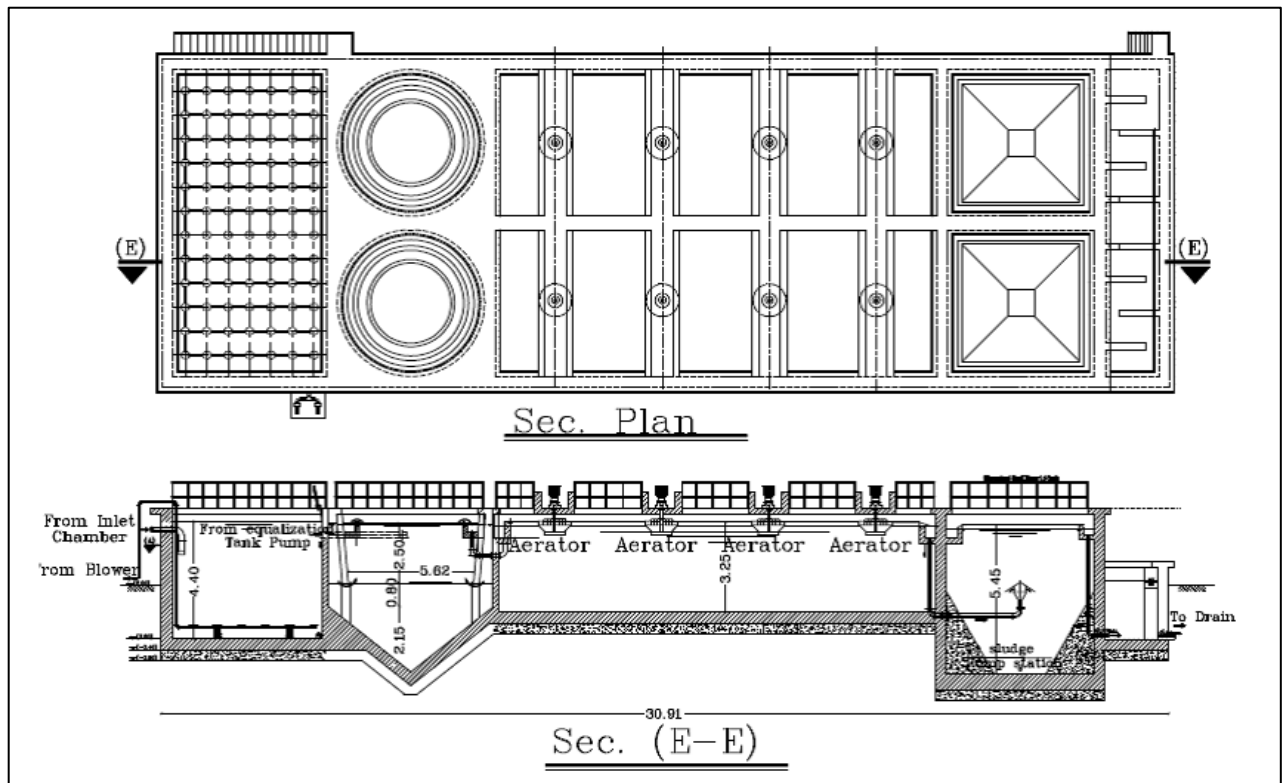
Section elevation in the compact unit in the proposed wastewater treatment plant
